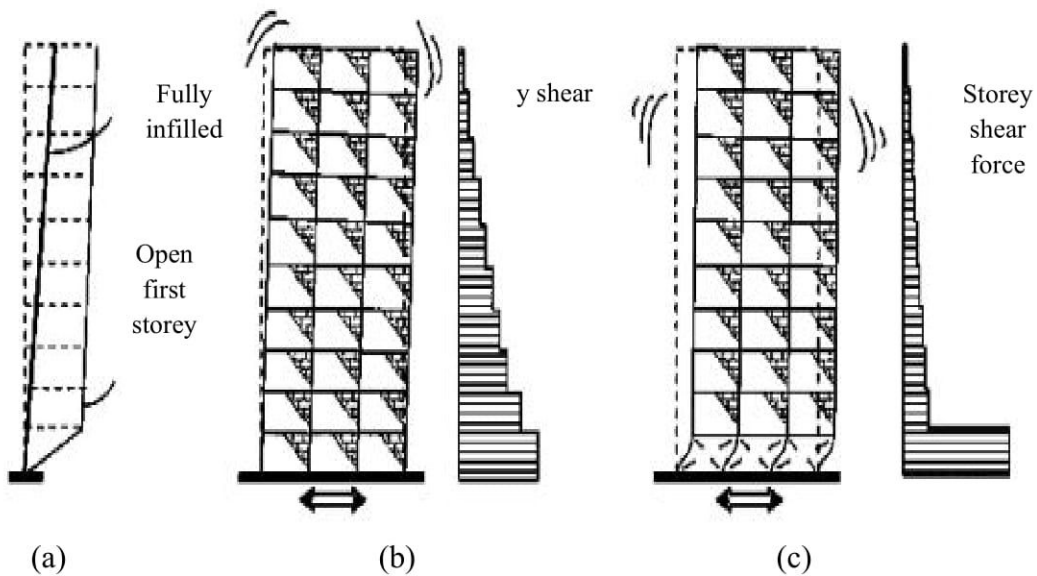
Effects of masonry infill on the first mode shape of a typical frame of a ten story RC building (a) displacement profile (b) fully infill frame (c) open ground floor frame (EERI, 2001)
